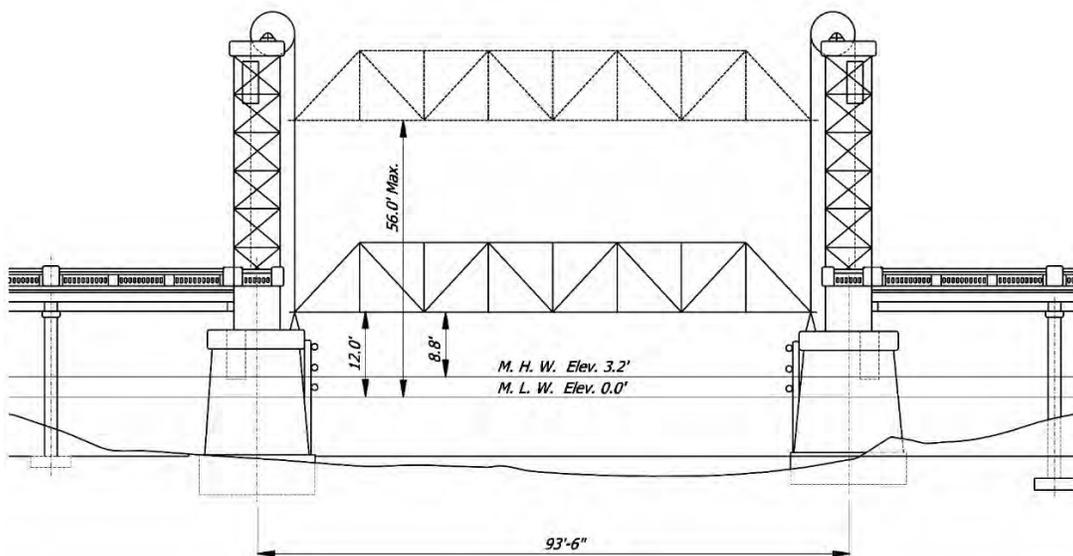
Bridge elevation view for a vertical lift bridge indicating vertical clearances. (Source: Florida DOT)
